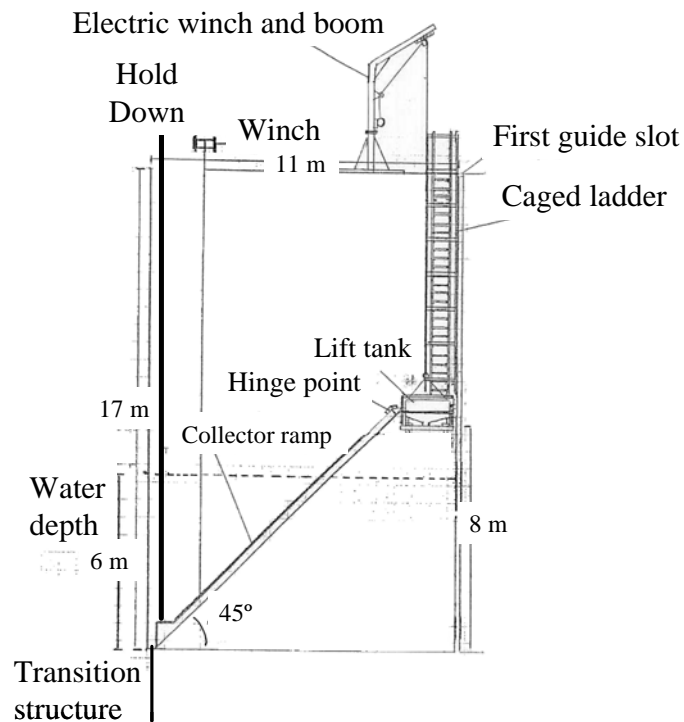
Side view (north wall) of the prototype entrance collector at the downstream Washington-shore fishway entrance.
